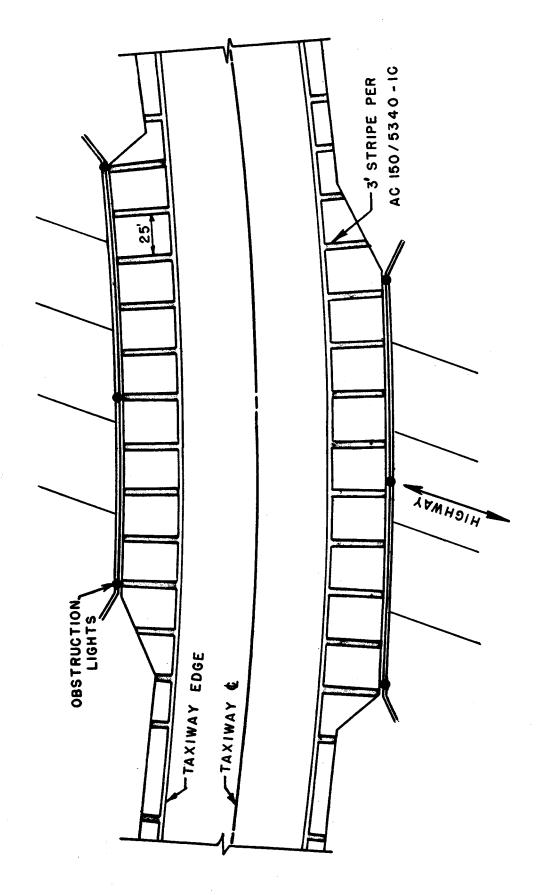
Suggested shoulder marking of minimum width taxiway bridge
